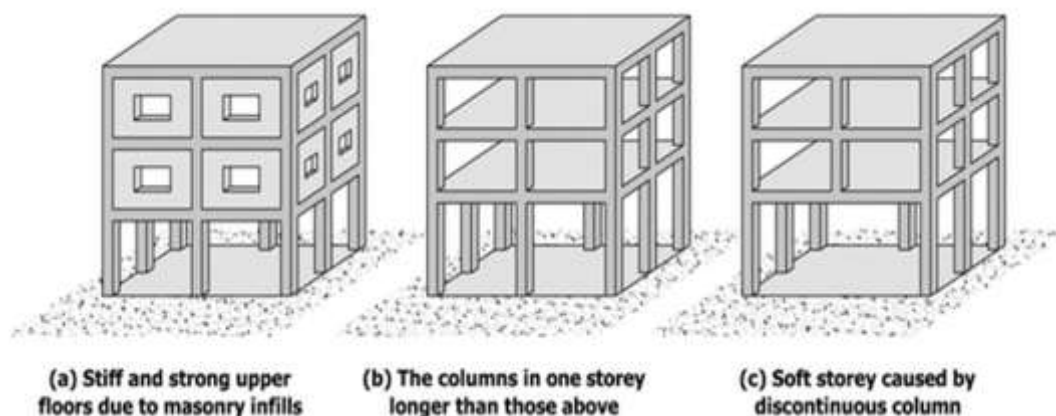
Effects of Column Discontinuity on Building Stiffness: (a) Stiff Upper Floors due to Masonry Infill, (b) Longer Columns in One Storey, (c) Soft Storey due to Discontinuous Column
